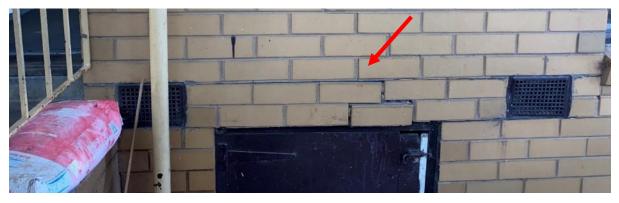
shows the stair-pattern crack and the loose brick.
